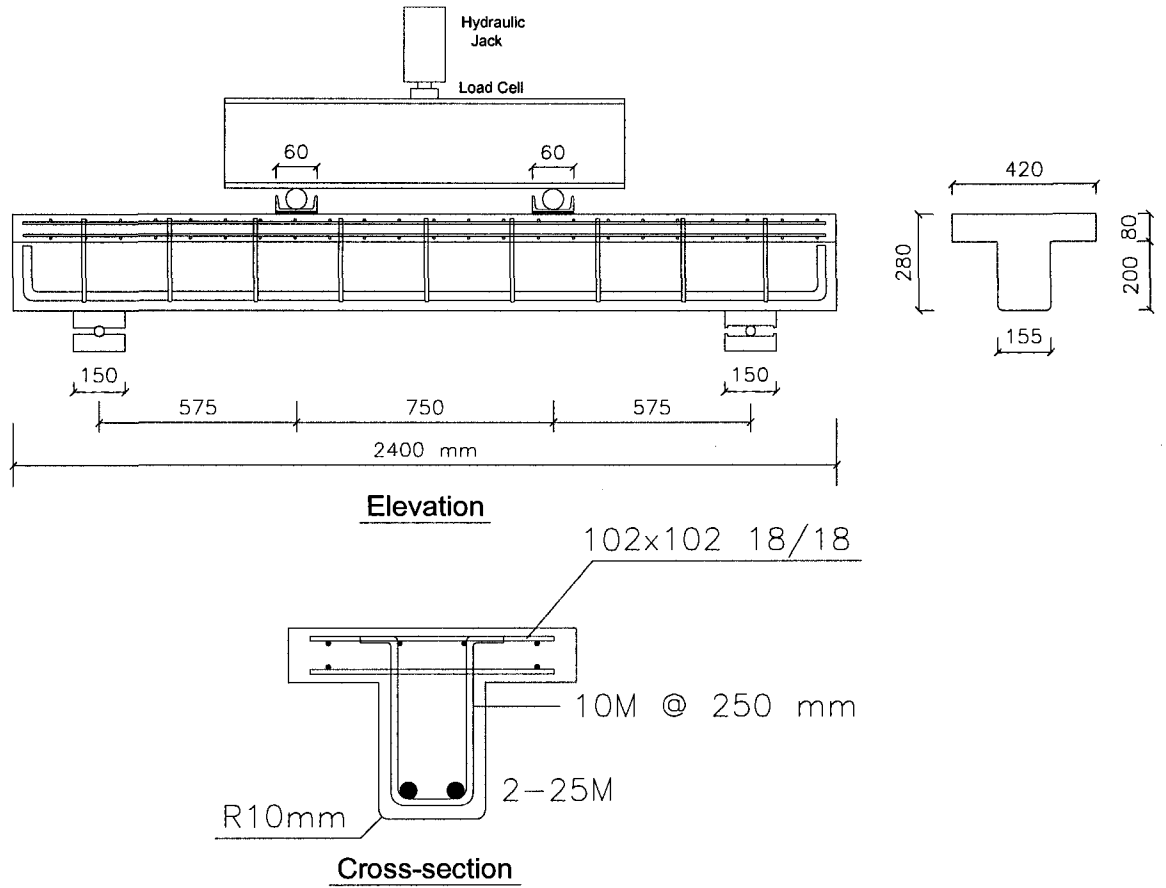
Dimensions and details of reinforcement of the three shear-critical tested beams
